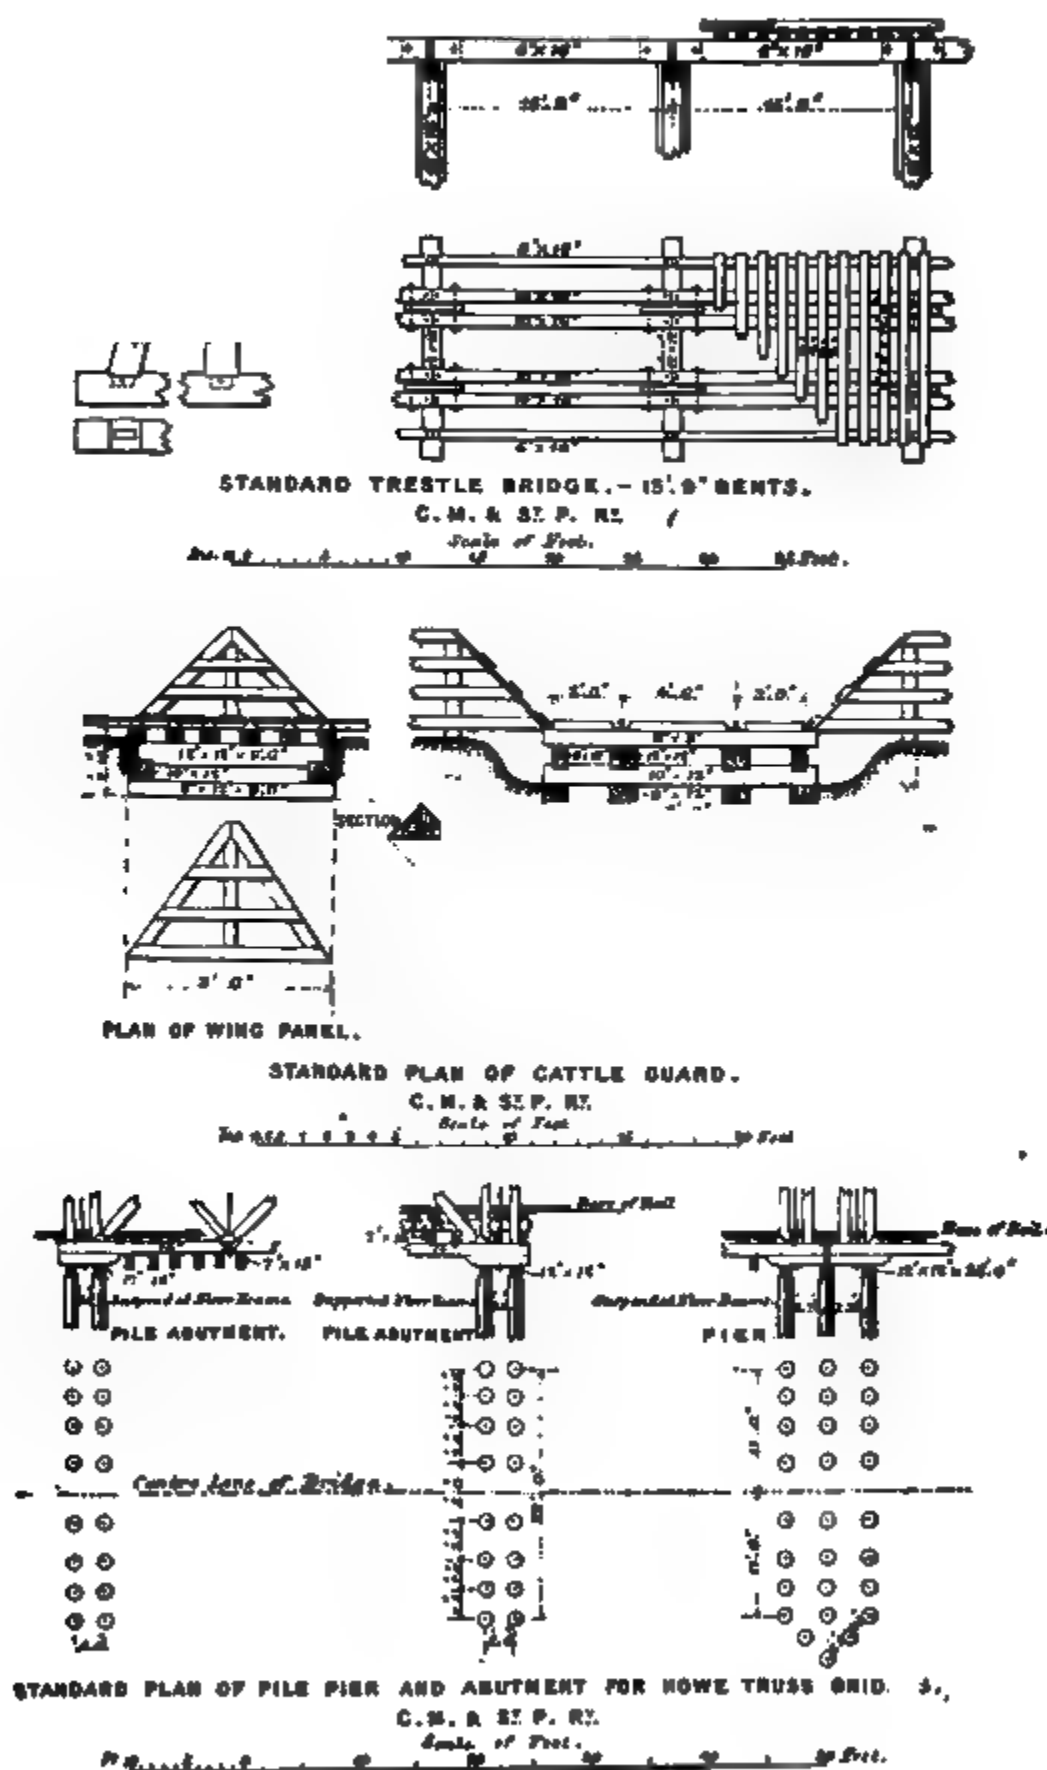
STANDARD WOODEN TREESTLE CATTLE-GUARD AND PILE ABUTMENT, CHICAGO, MILWAUKEE & ST. PAUL RAILWAY.
